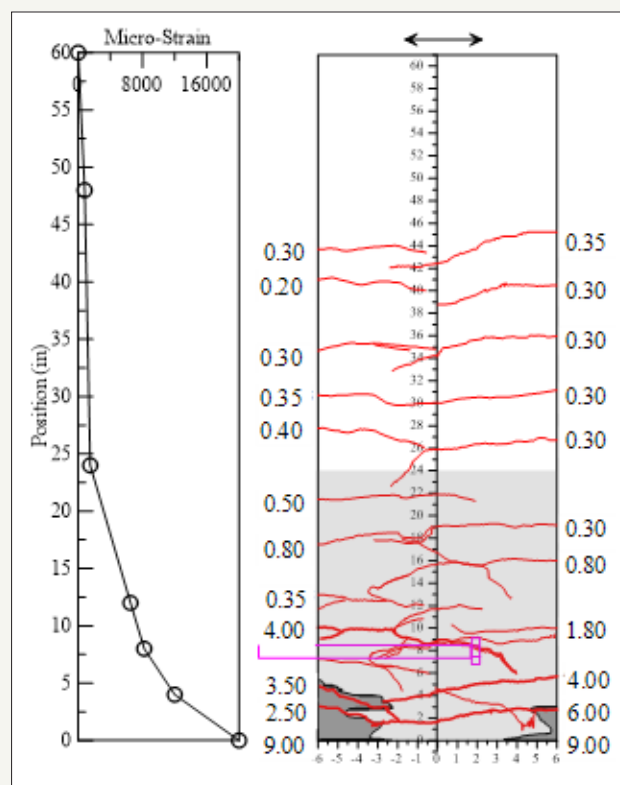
Crack map of Specimen T2 column at $8\Delta_y$ (Crack width in mm; 1 in.=25.4mm).
